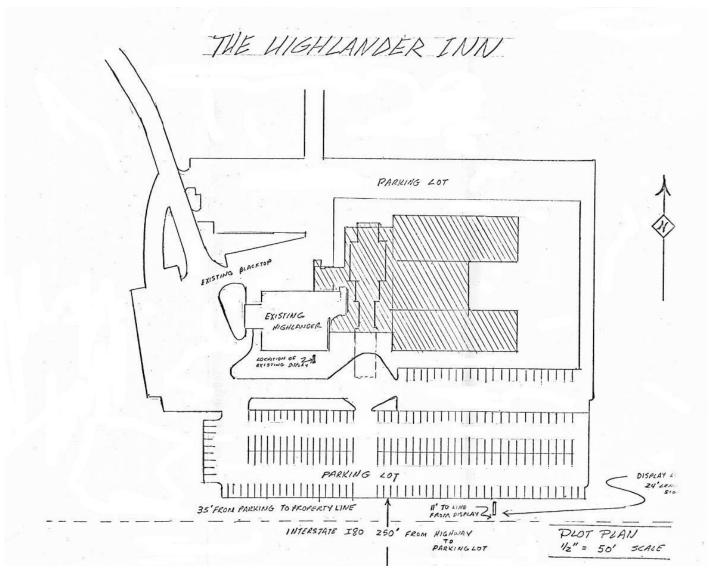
June 1973 site plan and proposed sign relocation (Courtesy of Sheila Boyd)
